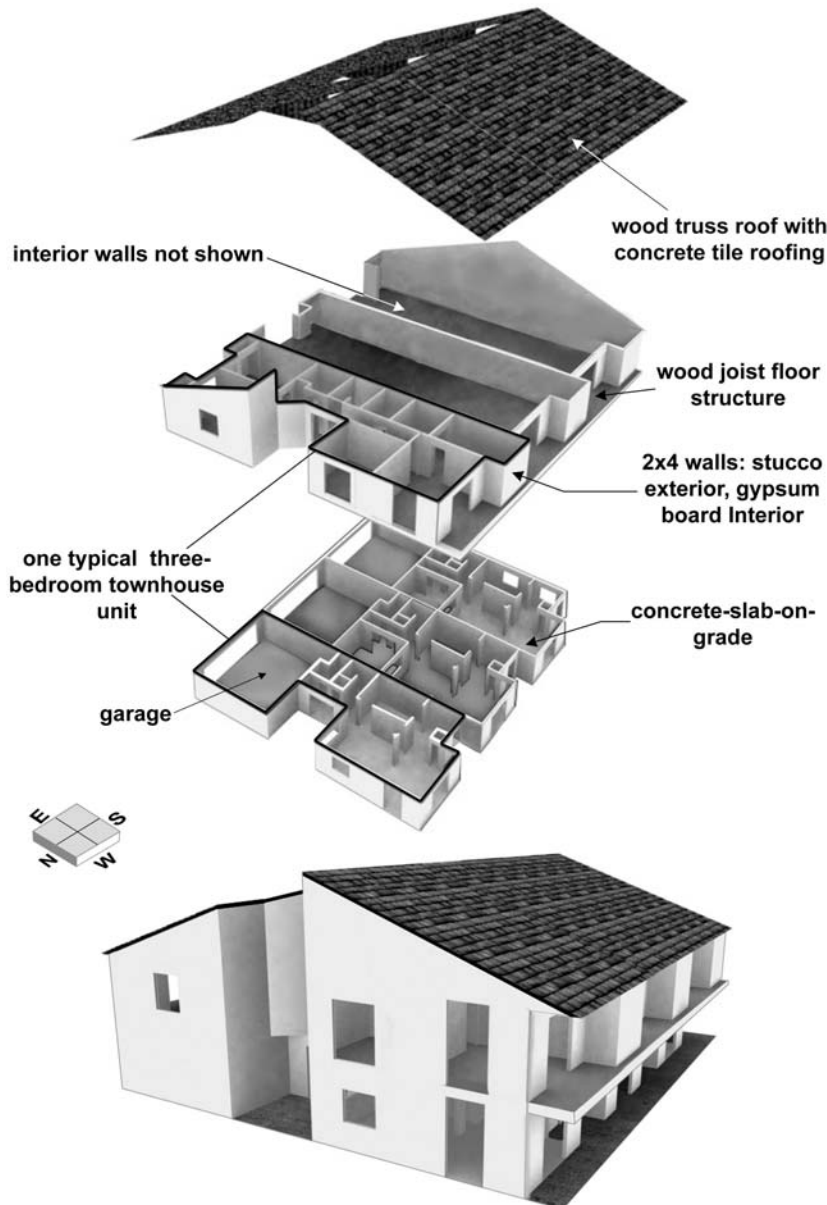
Townhouse index building (reproduced from, with permission, Reitherman et al. (2003))
